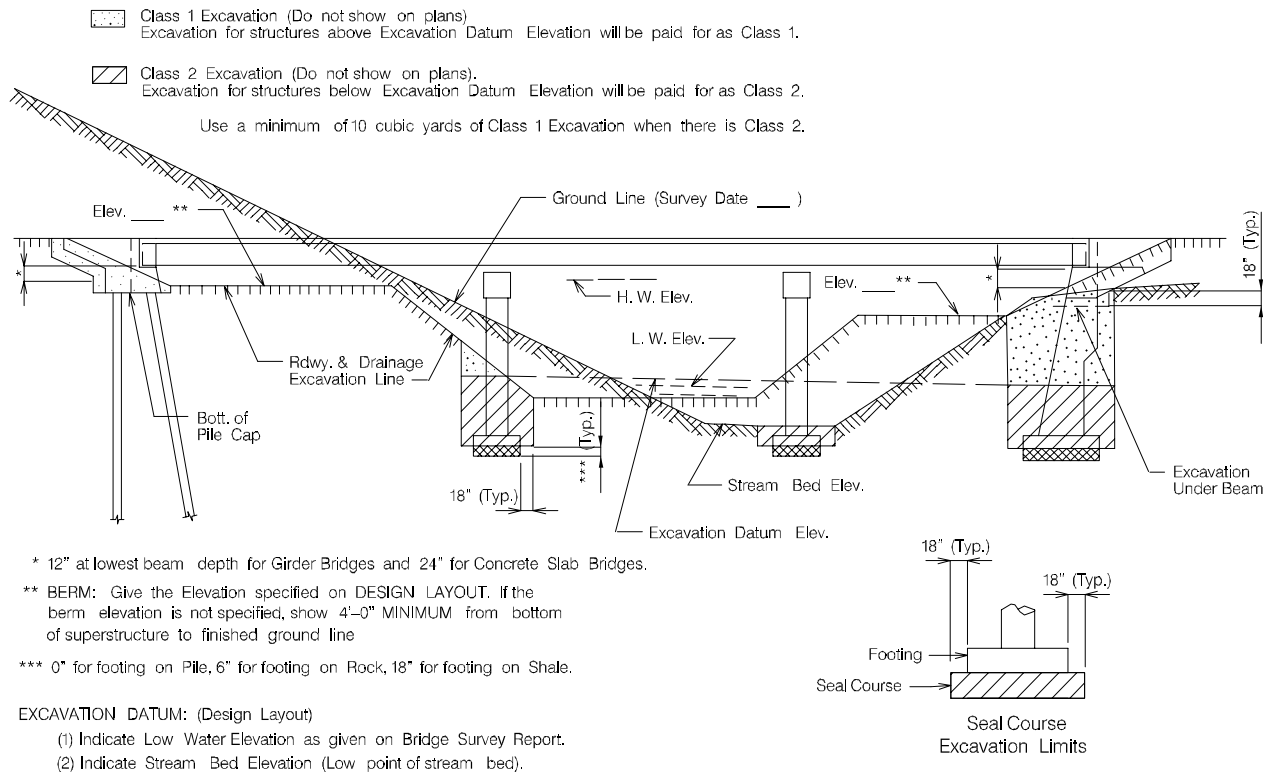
6 Excavation Limits: Stream Crossings (Typical)
